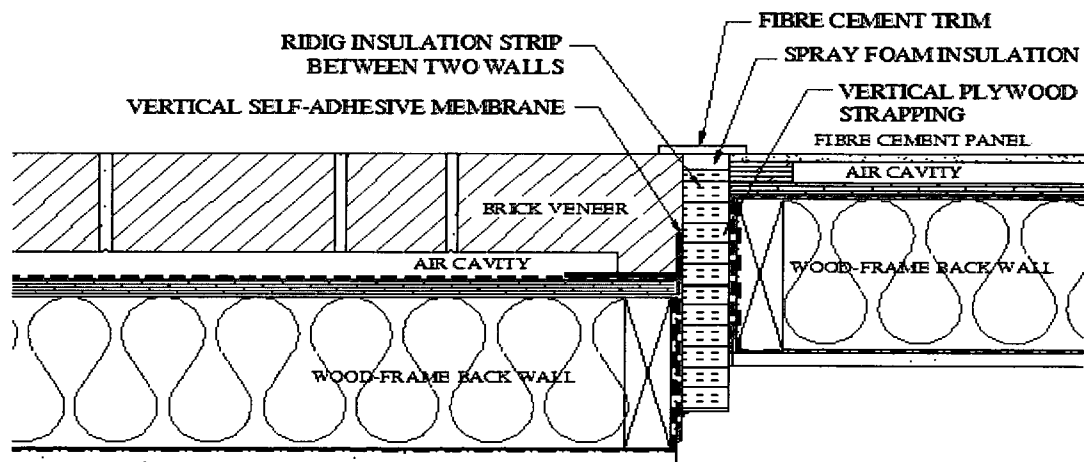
Typical vertical connection detail between brick wall and fibre cement wall.
